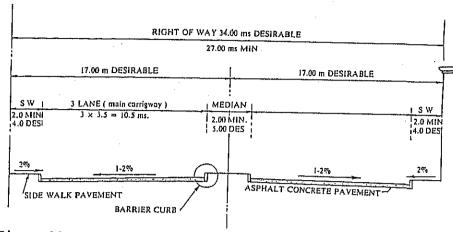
Typical Cross Section of Sekket Al Wayli
